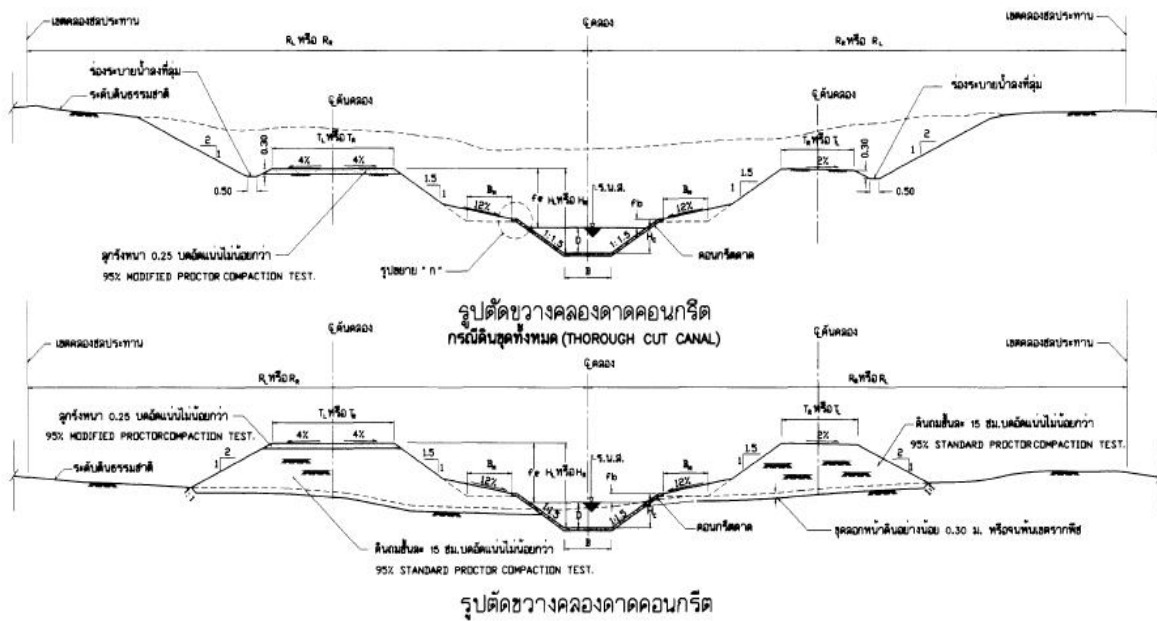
Standard Drawings of the Concrete Lined Canal
